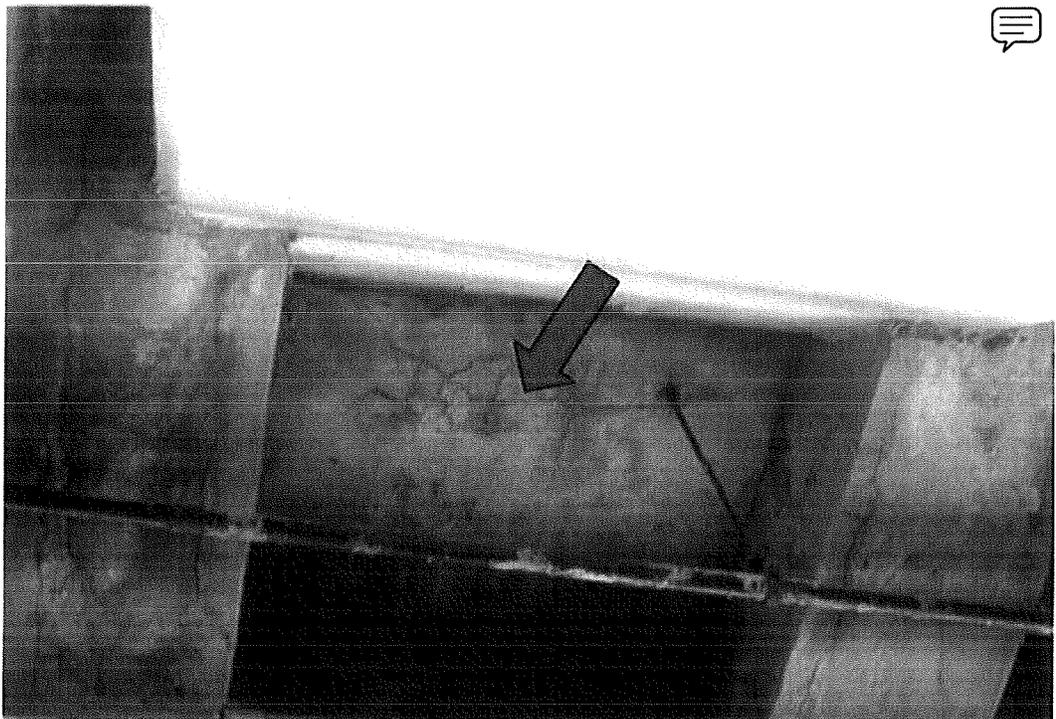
Cracked and hollow sounding concrete encasement of beams and underside of the slab. Located at the underside of Parking Level 6, Column Line 27/U0. (Approx. 9 SF)
